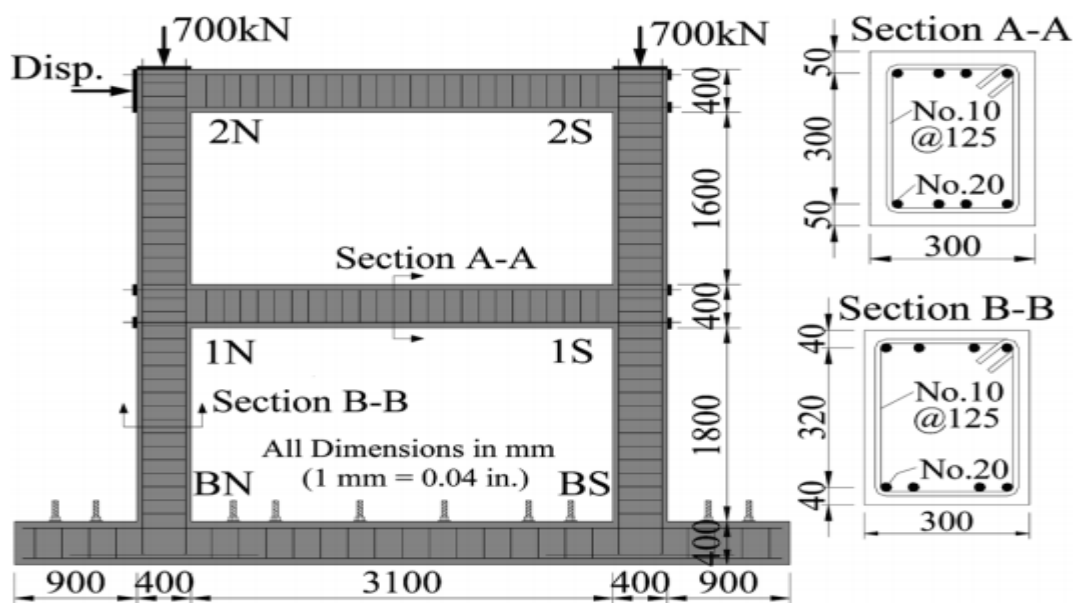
Structural details of Vecchio and Emara (1992) frame.
